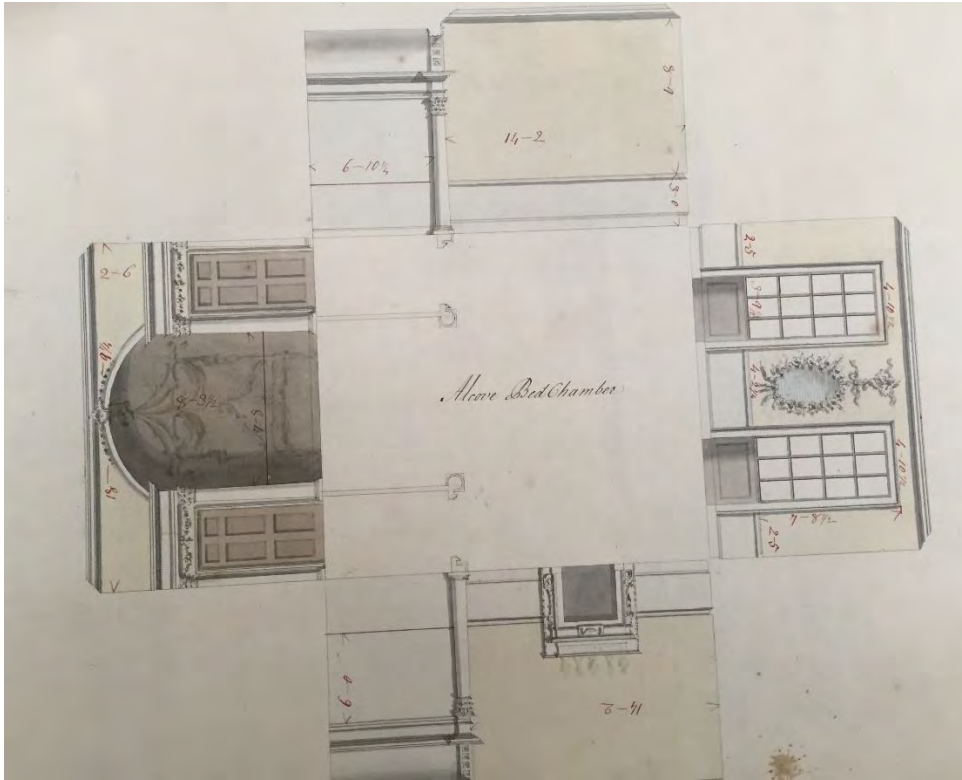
Lightoler's plans for the first-floor alcove bedchamber at Platt Hall (MCAg: 1961.165A)
